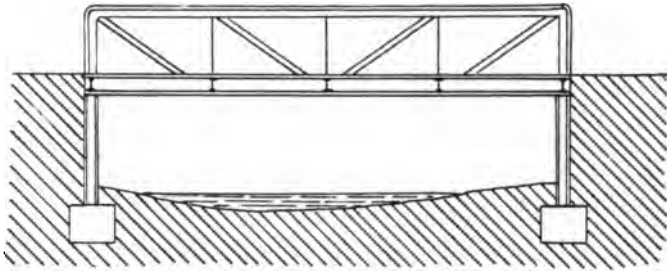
STEEL BEDSTEAD BRIDGE.
